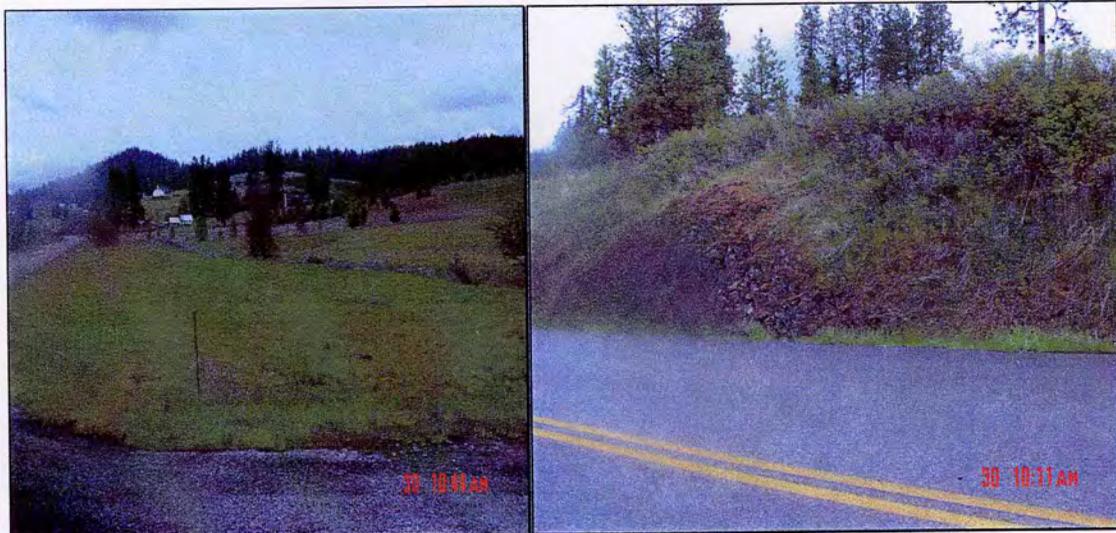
Photo showing Typical GTU 3 Conditions – French Gulch Area
